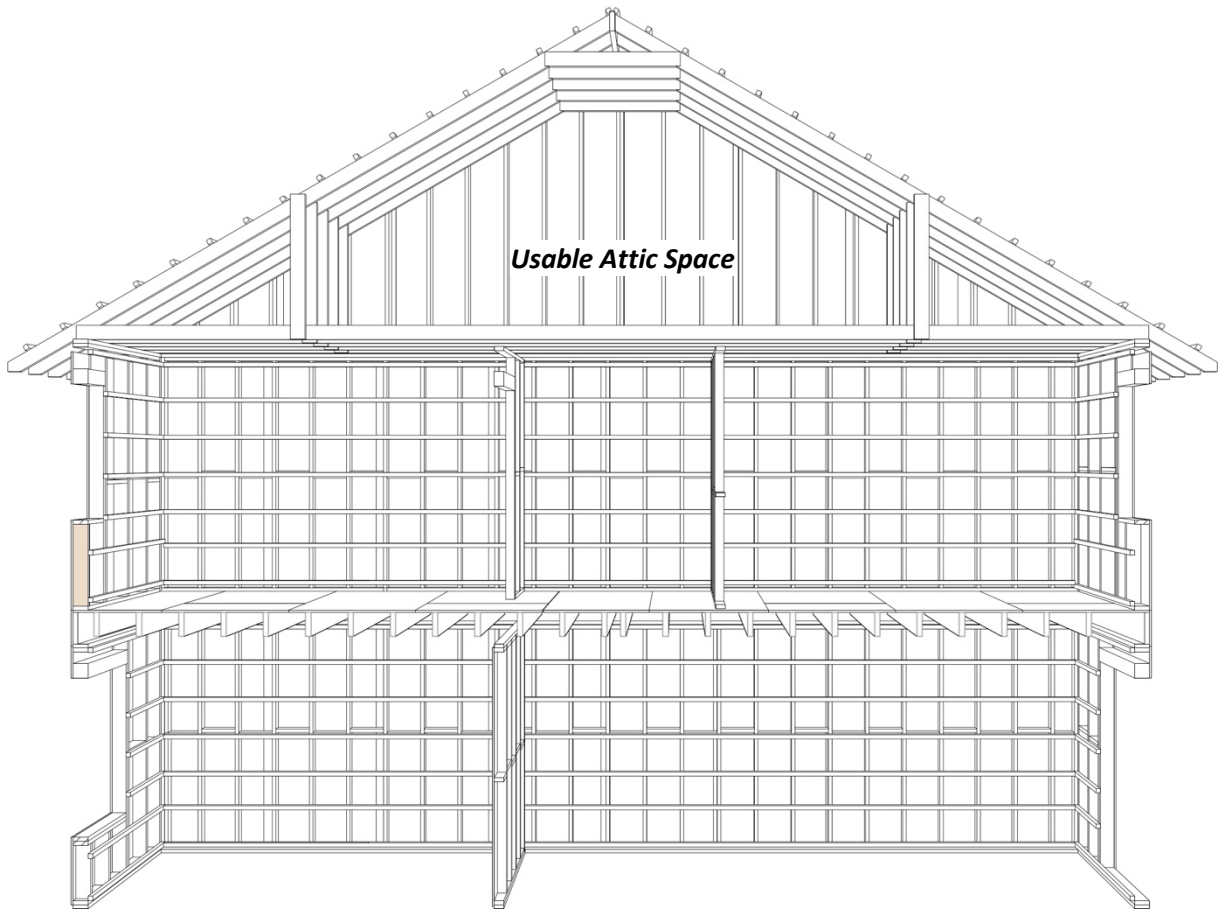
Revised Section layout with framed roof allowing future occupation (Walsh 2021)
